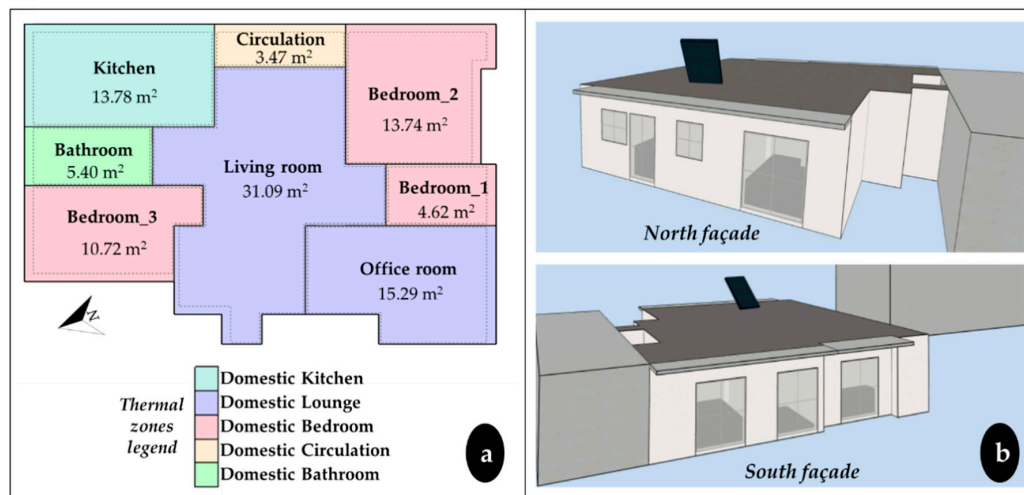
(a) Plan of the apartment and thermal zones, (b) render view.
